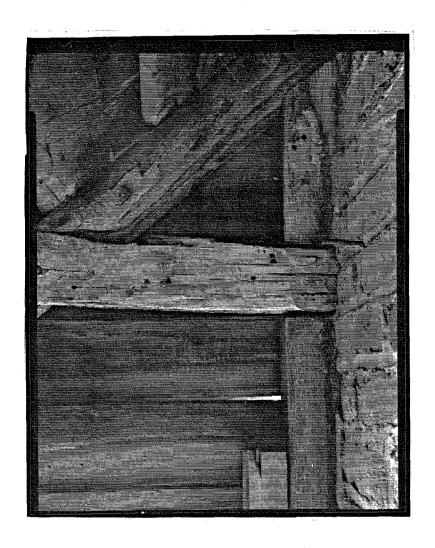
Hermitage Quarter, detail of collar beam and chimney stack in south gable end of attic, looking south.
